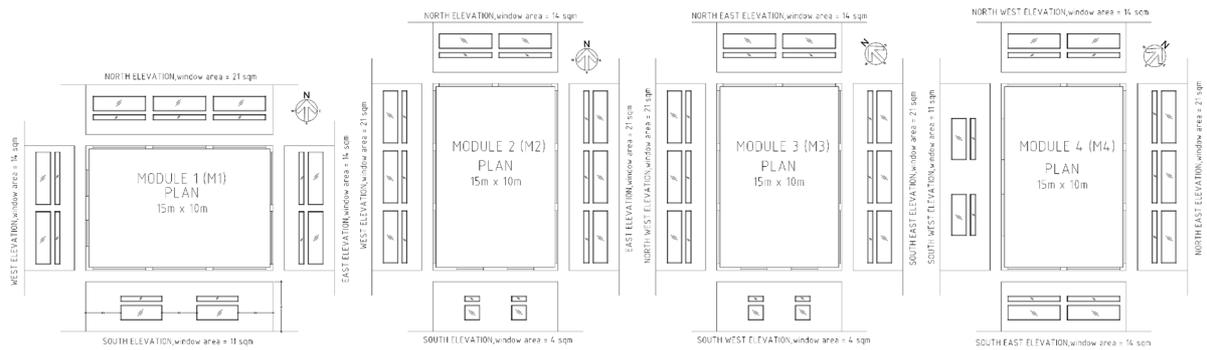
Plan & elevations of design cases for Kolkata 30 WWR
